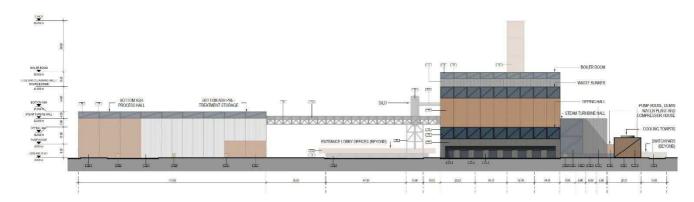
Northern Elevation (Source: Jacobs drawing IS305100-0000-ARC-DRG-0002 Rev B)
